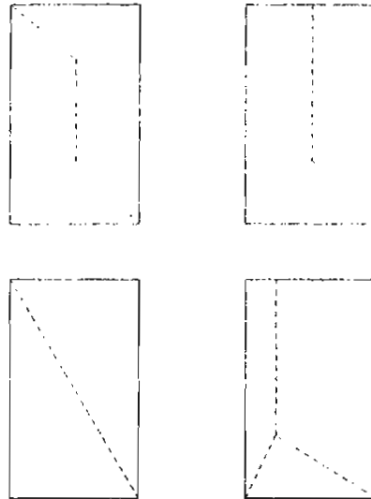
Failure Patterns of Concrete under Static Compressive Loading
